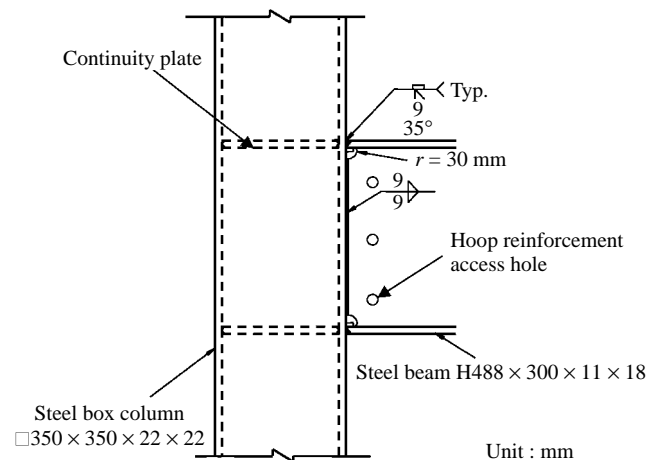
Details of steel beam to steel box column welded joint
